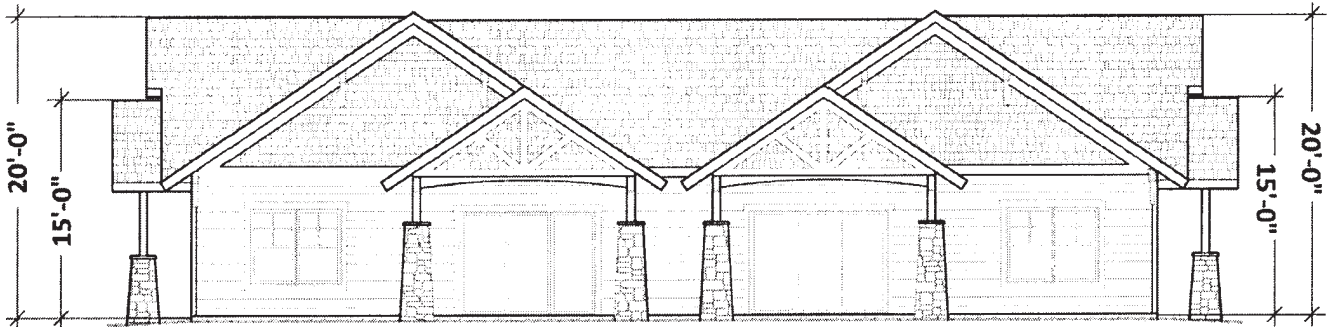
" LEFT AND RIGHT EXTERIOR ELEVATIONS
